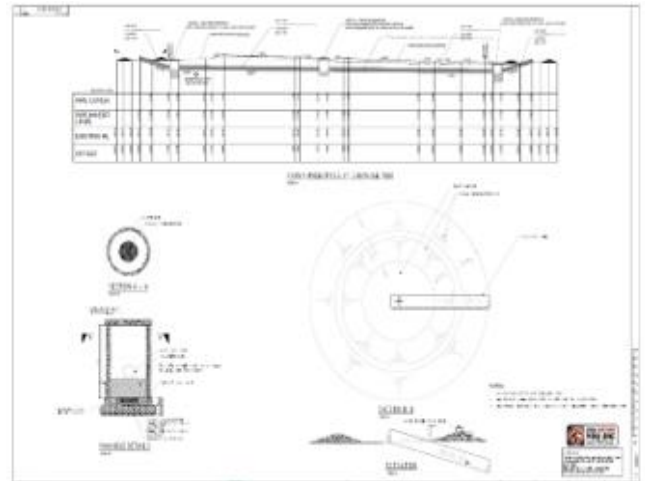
Fauna underpass at Beeliar Drive, Source: Sectional detail of tunnel, drawing no. 2956B10-12, dated; October 2011, from project construction drawing
